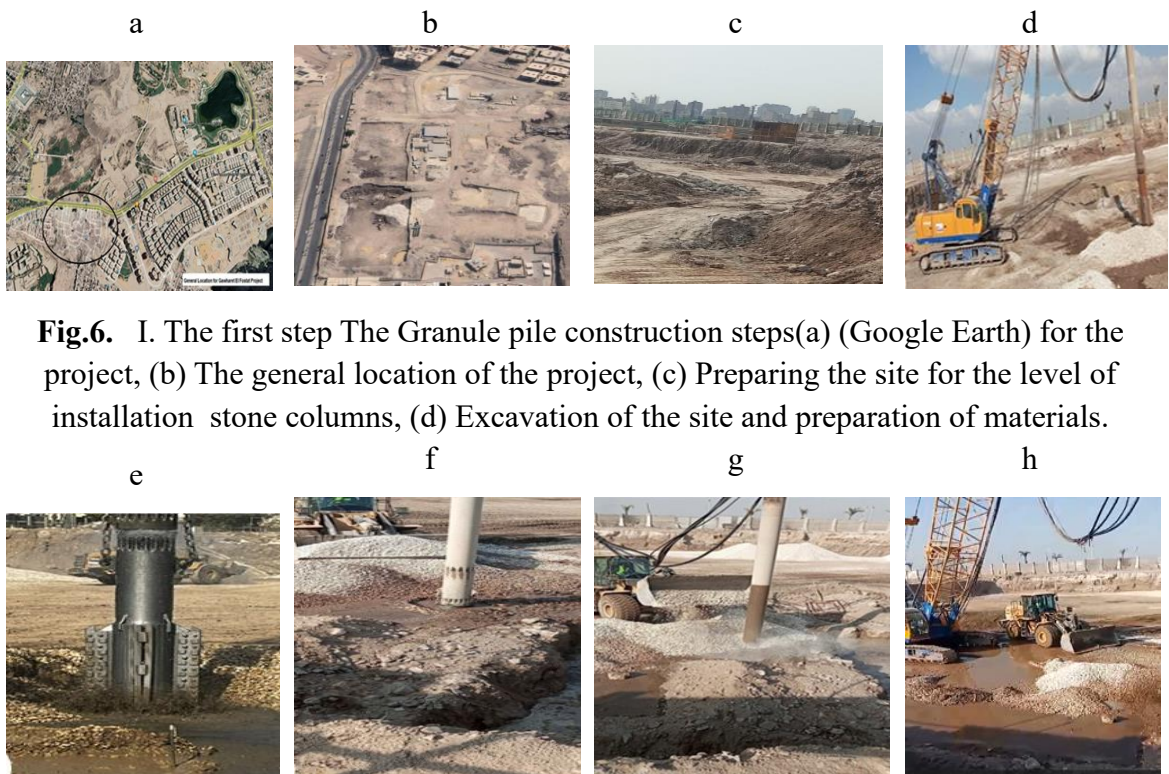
I. The first step The Granule pile construction steps(a) (Google Earth) for the project, (b) The general location of the project, (c) Preparing the site for the level of installation stone columns, (d) Excavation of the site and preparation of materials.
